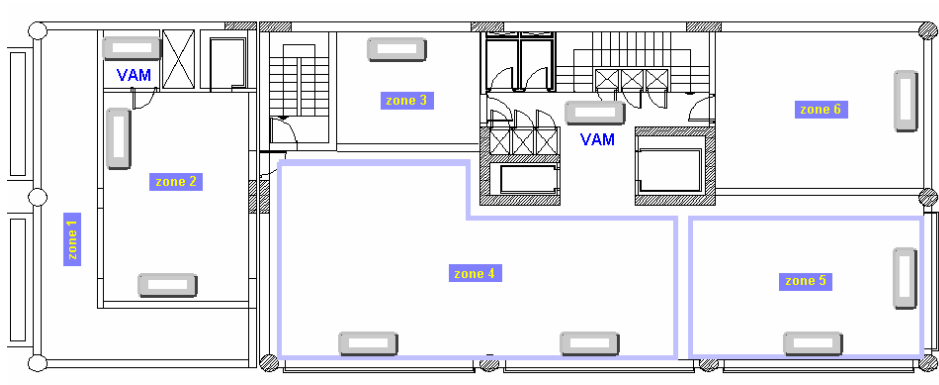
5<sup>th</sup> Floor and thermal zones plan of BYTE
